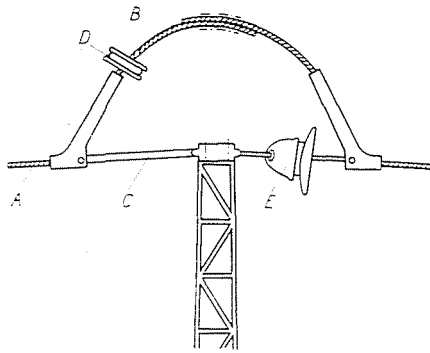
Detailed arrangement of connections at top of Tower No. 58
